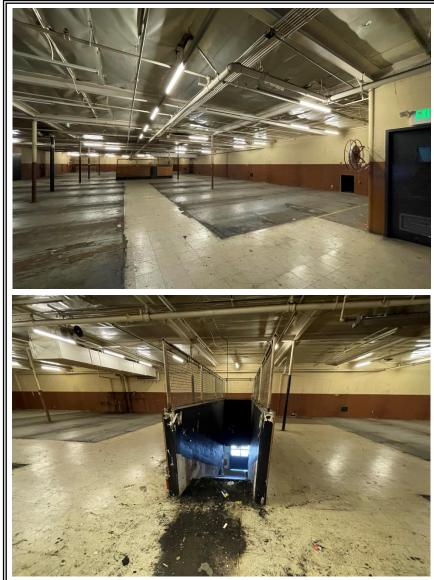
Main auto repair area with trench drain and locations of former hydraulic lifts.
